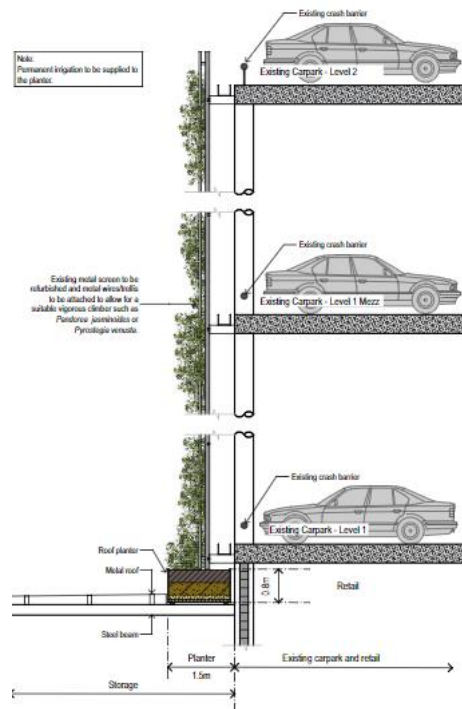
Section showing landscaping treatment to existing southern façade ('Typical Screen planting to existing car park')
